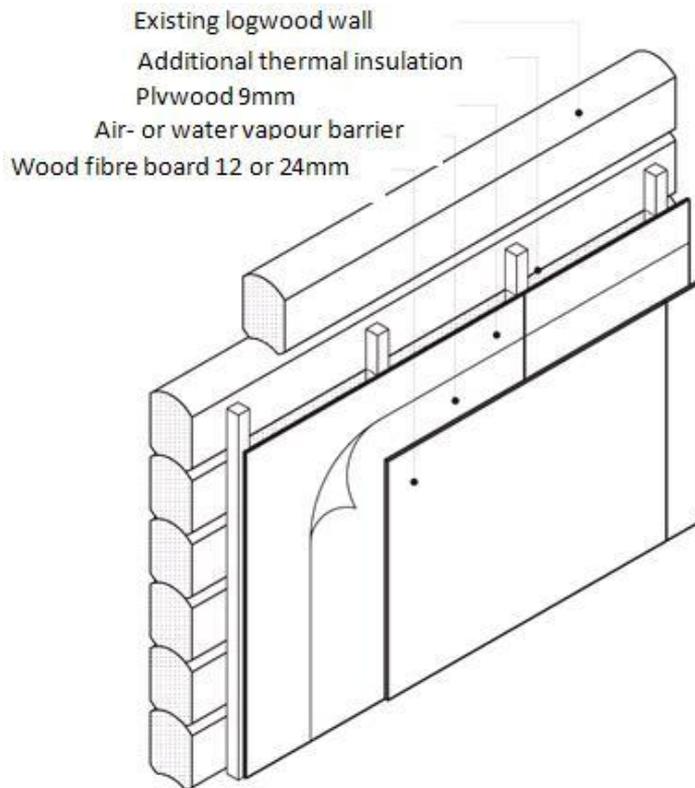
Additional thermal insulation of a logwood wall. Internal thermal insulation with mineral wool.
